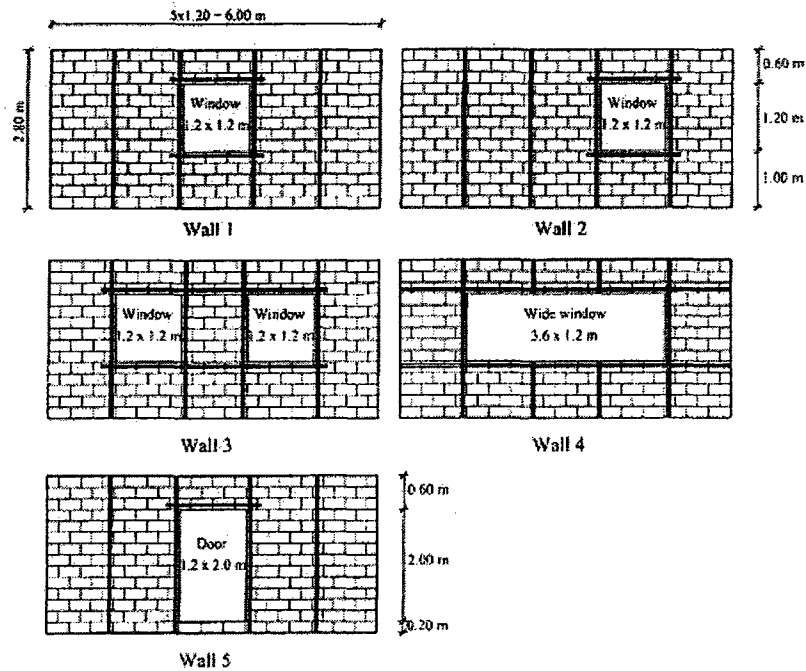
Elevation of strengthened unreinforced masonry walls with openings (Ghobarah and Galal, 2004)
